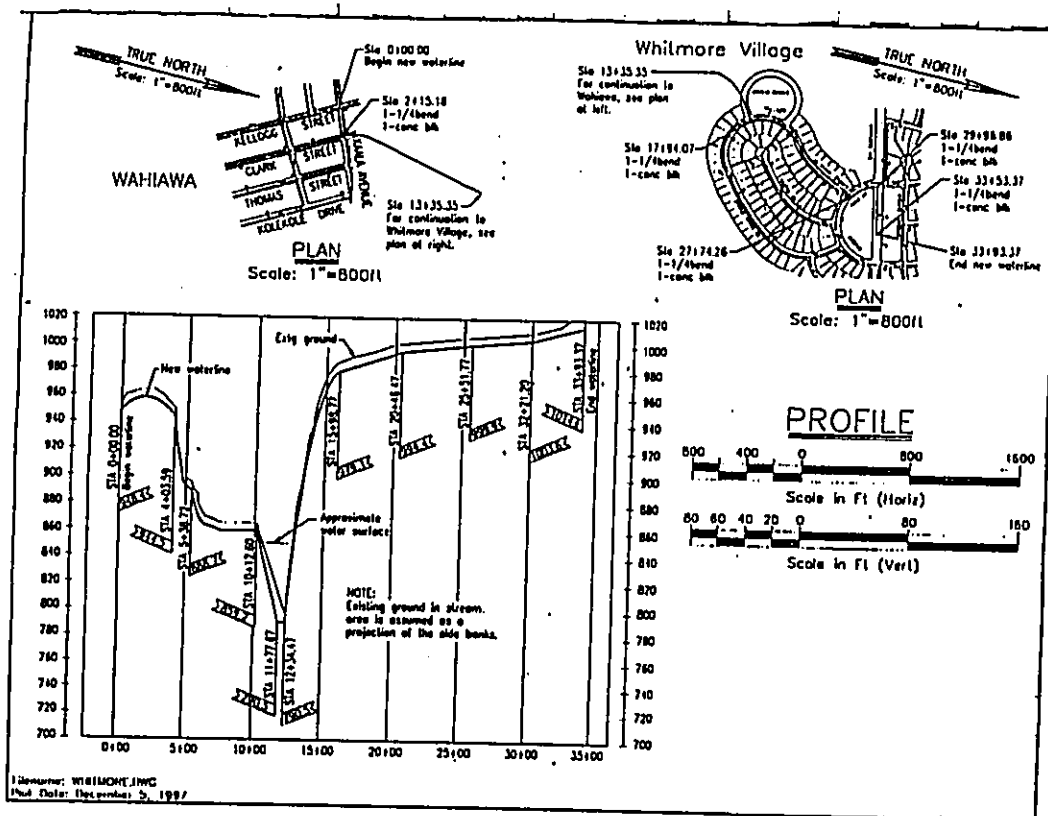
Plan and profile of proposed water line route (note steep slope into Wahiawa Reservoir- Kaunōkahua Stream gulch
